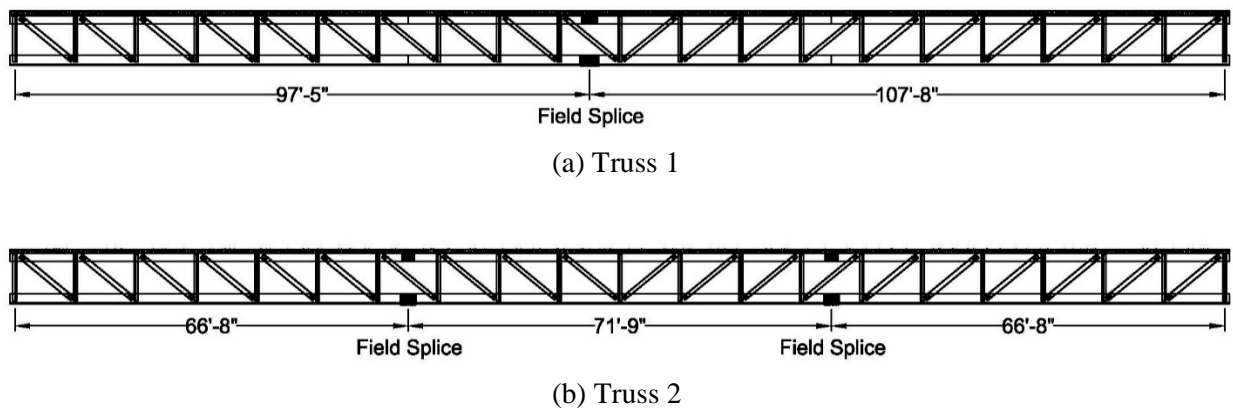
Proposed Truss Elevation with (a) Single-Splice and (b) Two-Splice Condition
